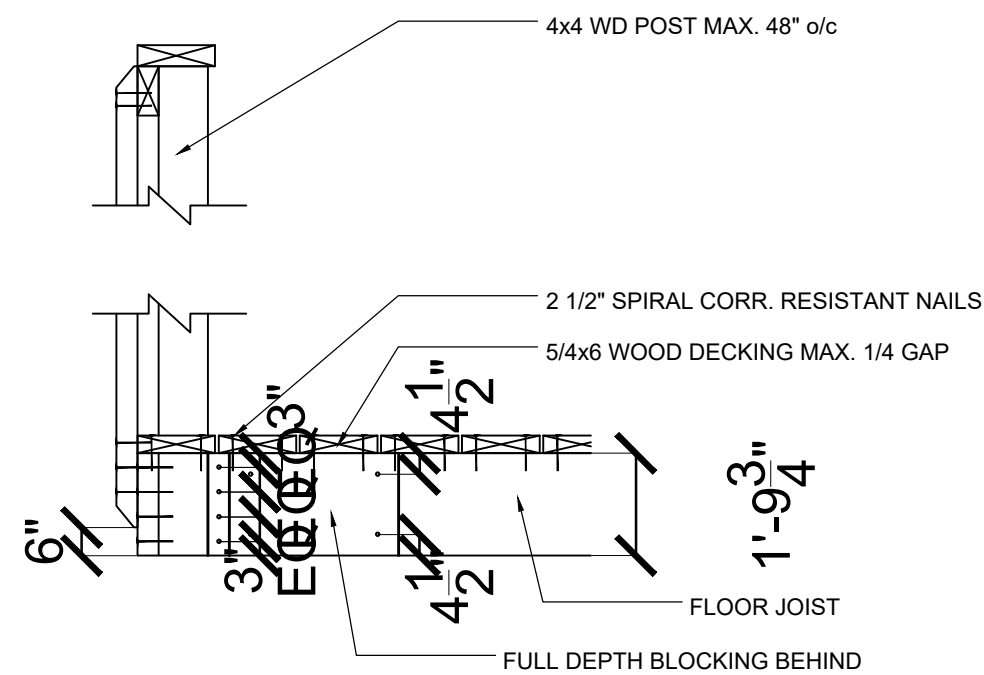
SB-7 TOP / BOTTOM RAIL CONNECTION TO EXTERIOR COLUMN
